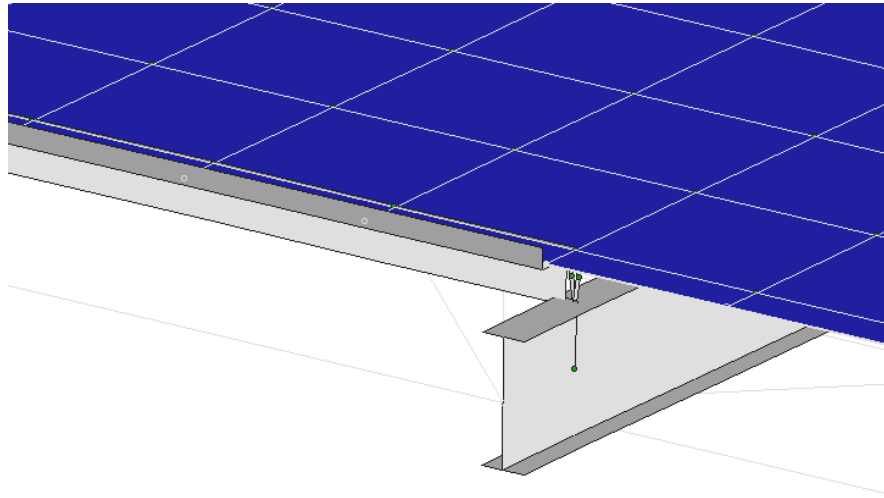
Prowers Bridge. Rendering of equivalent corrugated steel deck with deck edge angle on steel stringers on steel floor beam.
